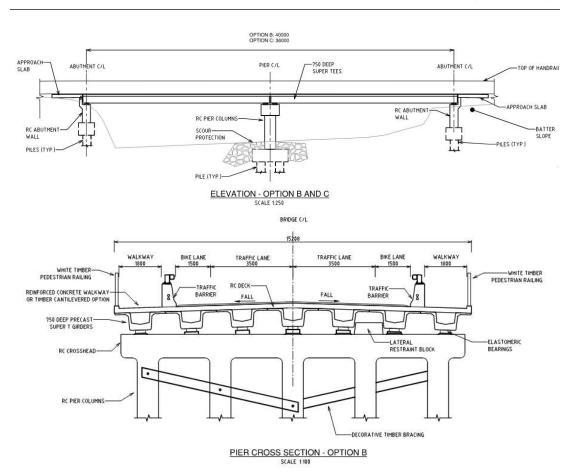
Edwards Bridge Renewal: Option B - Typical elevation and section
